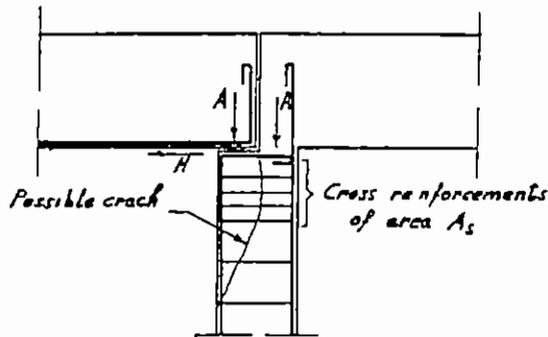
Horizontal forces and cross reinforcements at the head of a supporting column
